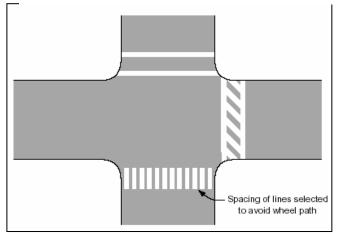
Crosswalk Striping Techniques Source: http://mutcd.fhwa.dot.gov/pdfs/millennium/ 12.18.00/3.pdf, p. 46
